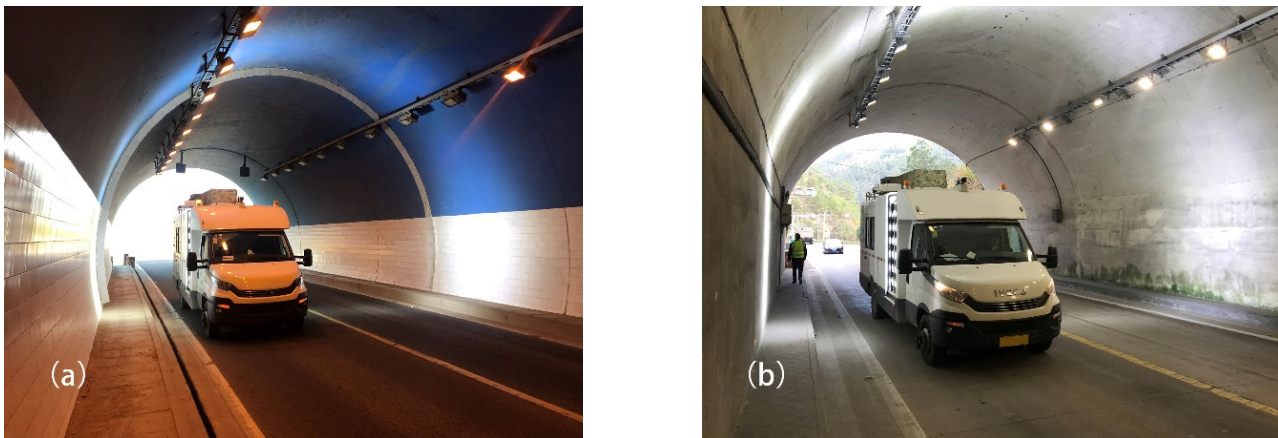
Tunnel inspection vehicle to carry out image collection (a) in the Shiziling tunnel, and (b) in the Zhaitouling tunnel.
